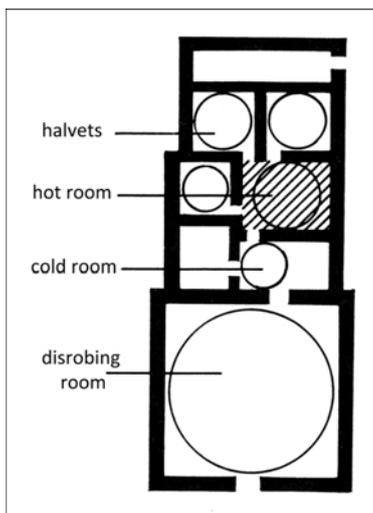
Floor plan of *Hünkâr hamamı* (plan after M. Harbova)
